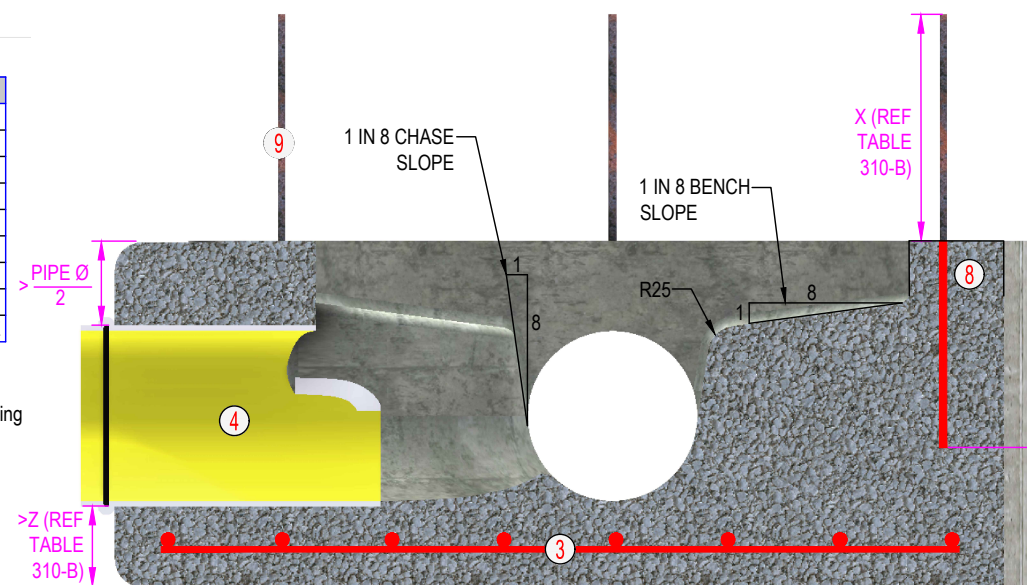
B: TYPICAL MANHOLE BASE (SECTION VIEW)
